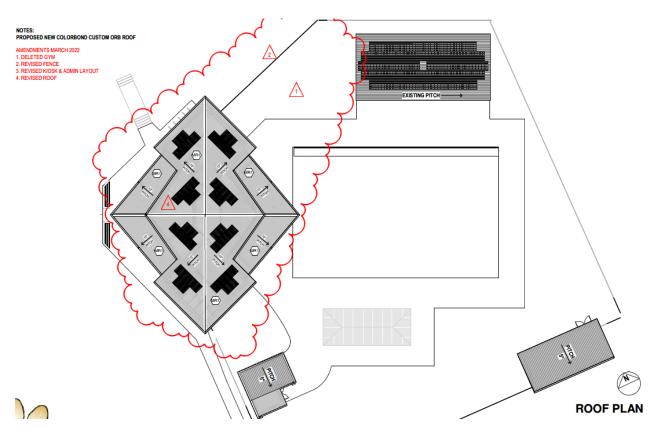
Compare to Figure 3 above – Modified design showing proposed roof plan
